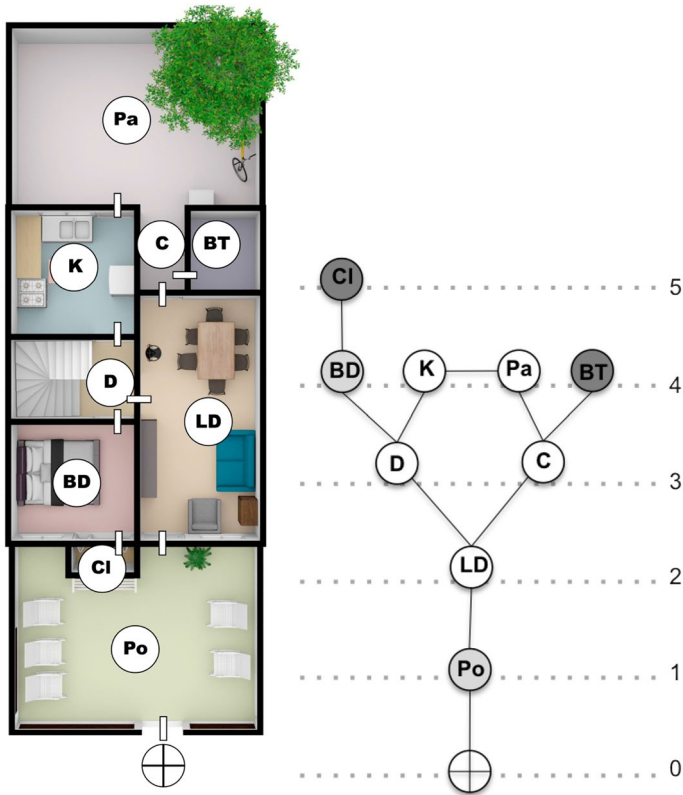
Transformed CQ5 annotated floor plan and JPG, with exterior as carrier
